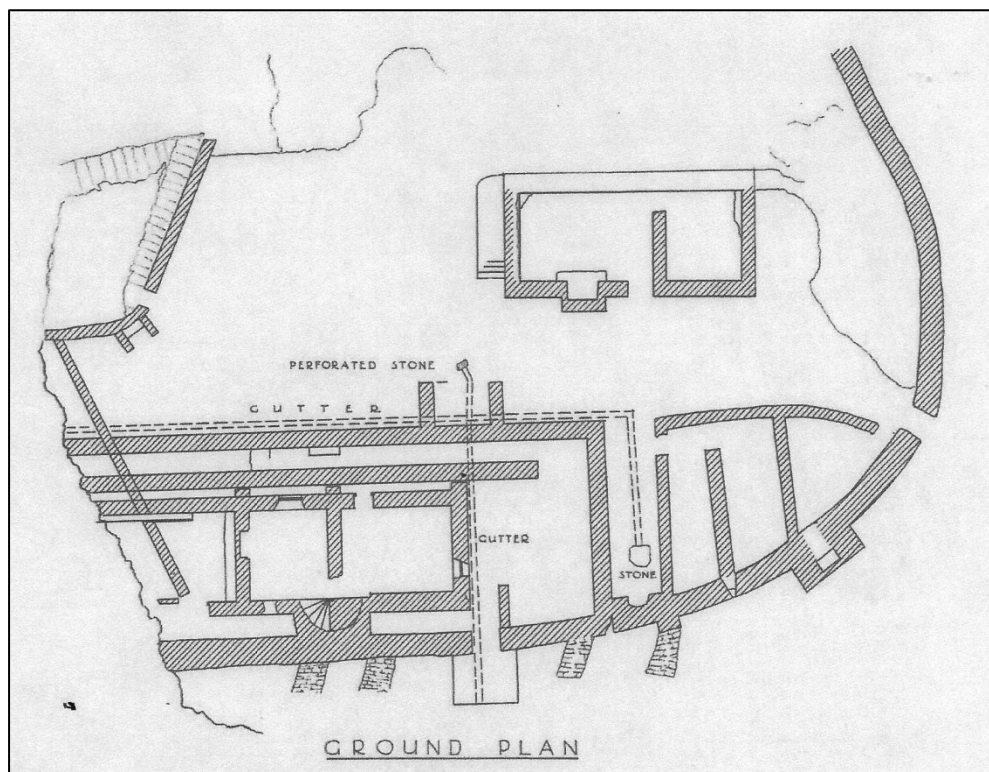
An extract from a 1932 Office of Works plan showing the short-lived walling along the cliff edge at the southern end of the Great Hall.
